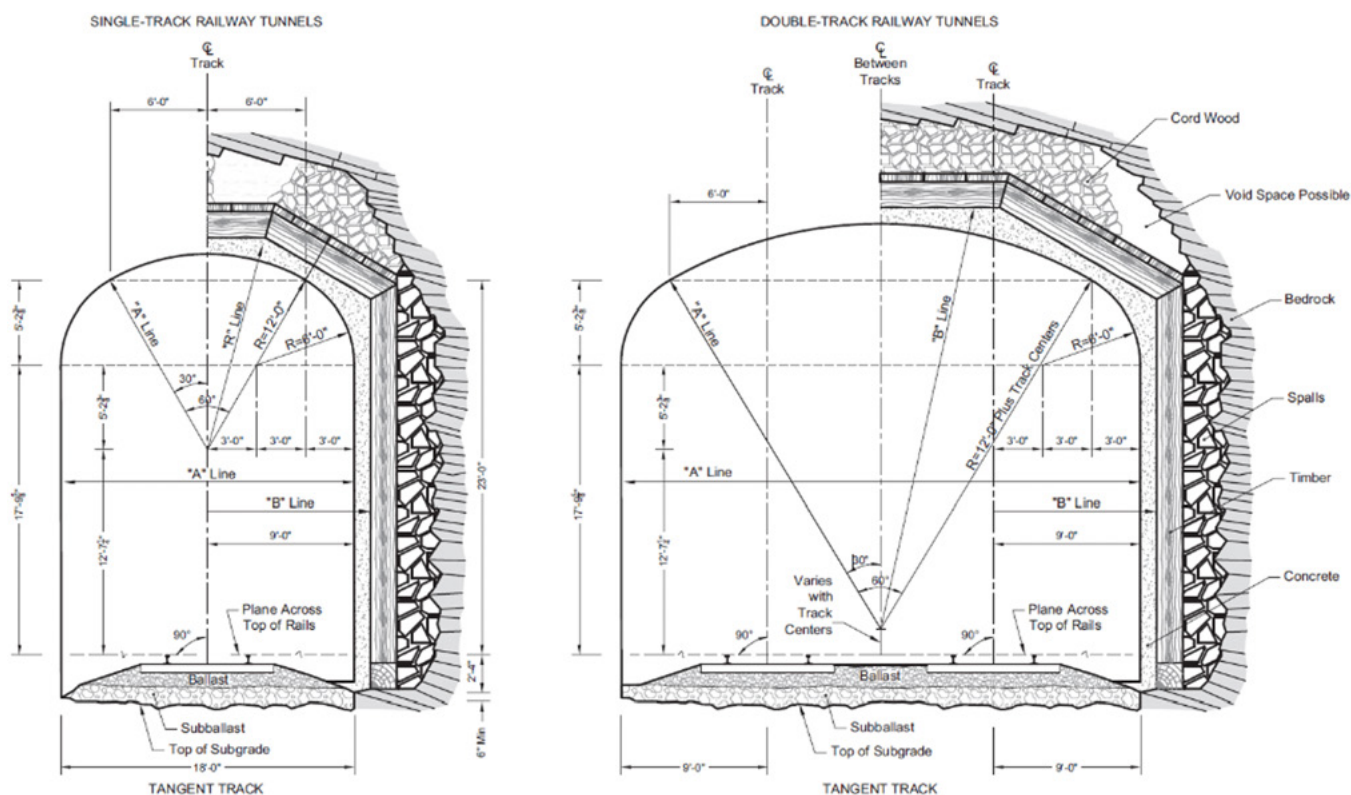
Single and double track railroad tunnels (AREMA)<sup>24</sup>
